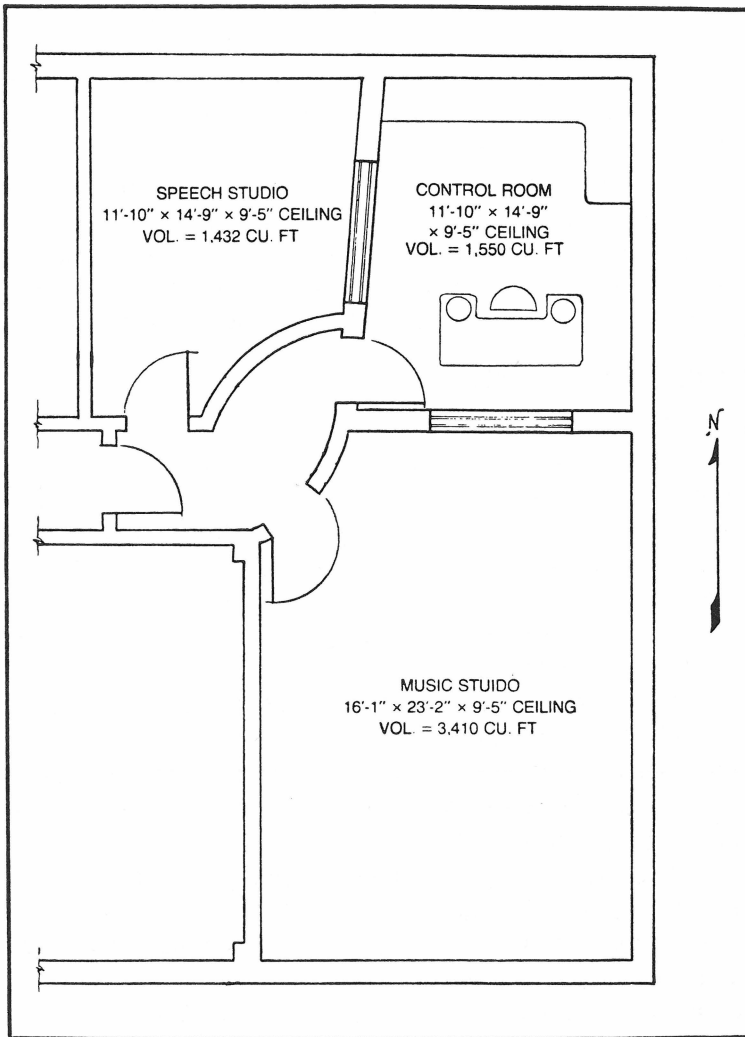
Floor plan of recording suite in which both a speech studio and music studio are served by a single control room. This arrangement works best if the work load is modest and the schedule flexible. A second operator can handle one studio (e.g. the speech studio) by monitoring with high quality headphones).
